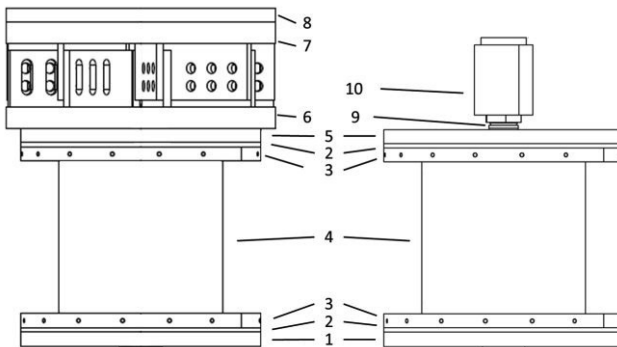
Test arrangements, clamped support (left), simply supported (right)
